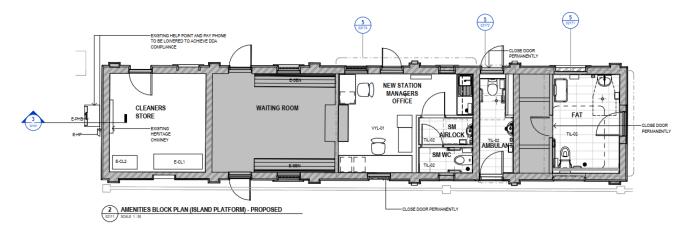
Proposed internal arrangement for Platform 2/3 building, as supported by Sydney Trains Customer Service team
